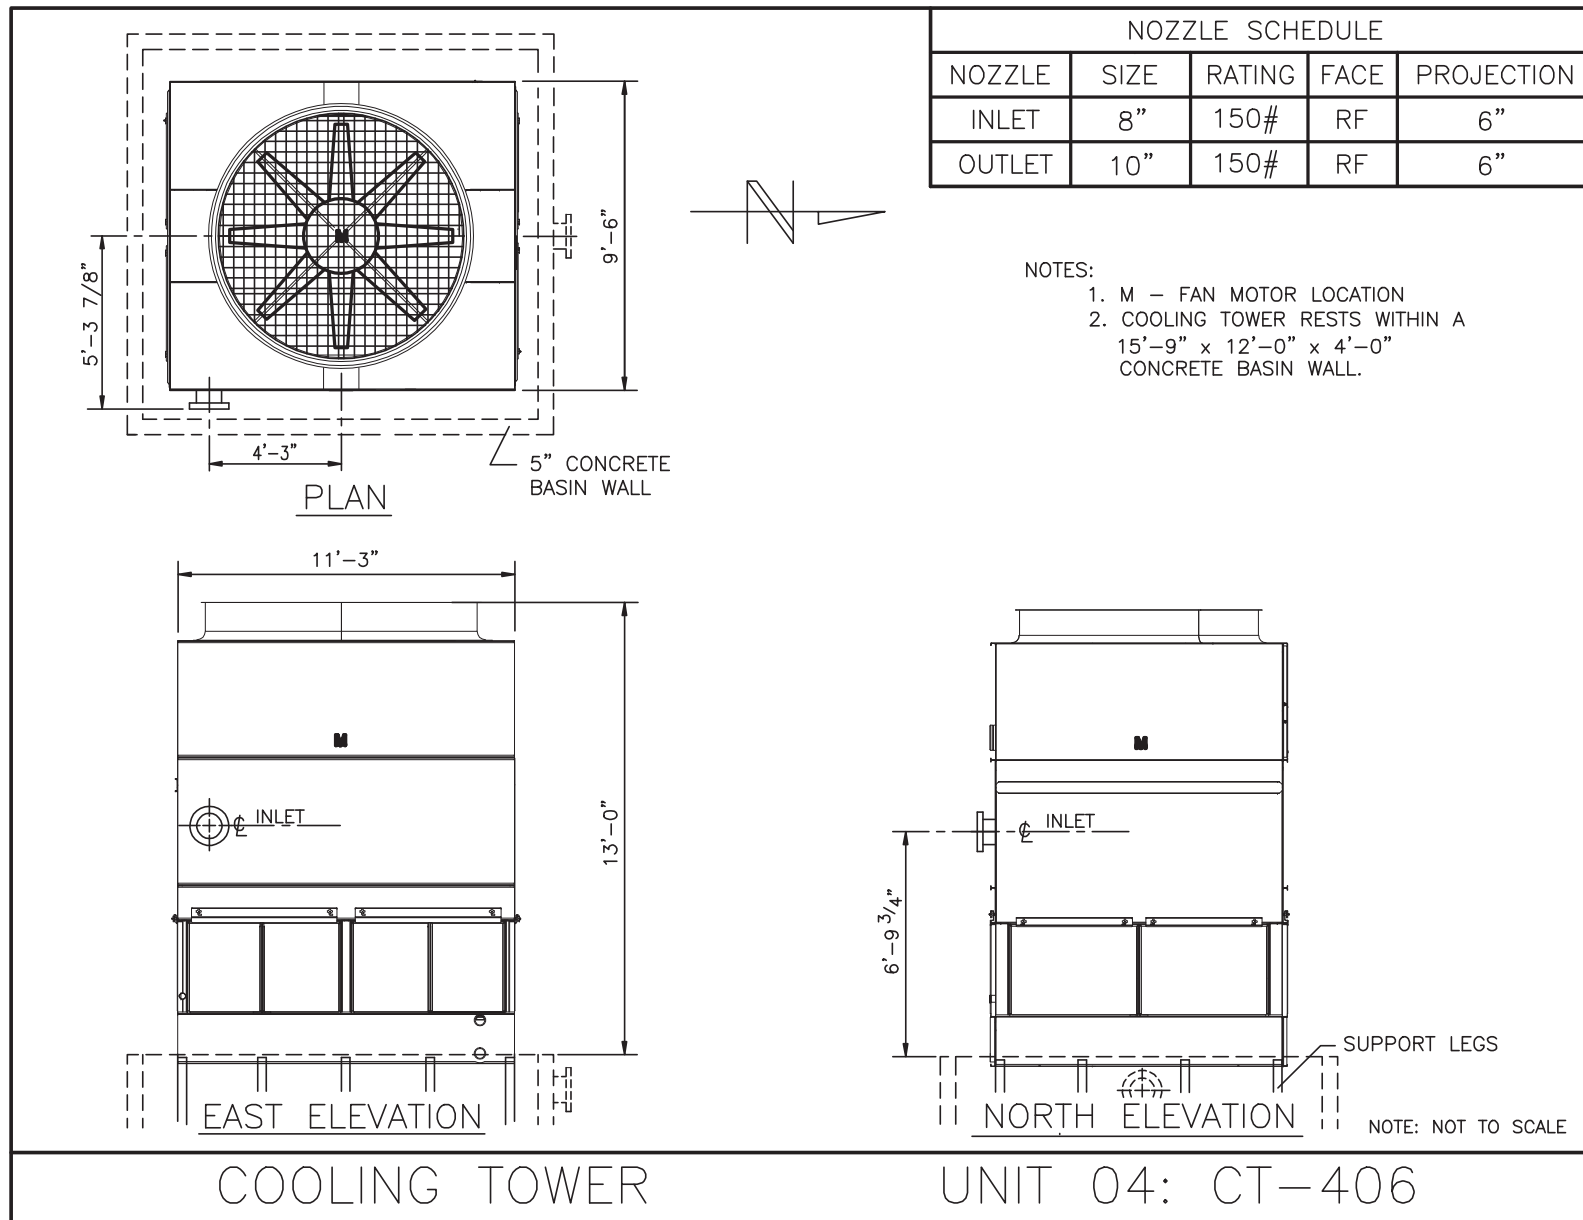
Unit-04: Cooling Tower 04-CT-406.
